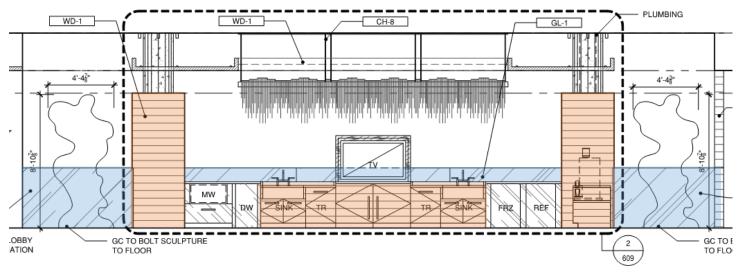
| Level 1 Interior Elevation - Entertainment Kitchen
